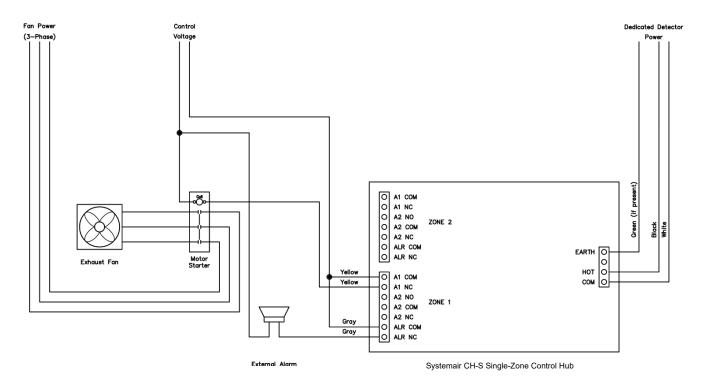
Wiring - Single Fan Ventilation System with One Zone
